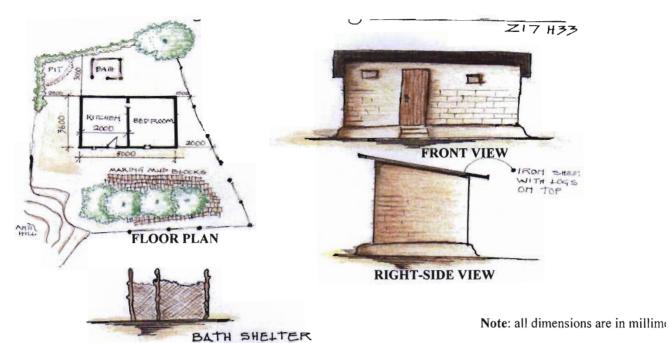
Sketch plan, Front and right-side views and bath shelter of House No. Z17-33, Kamatipa, Kitwe (source: author 2005).
